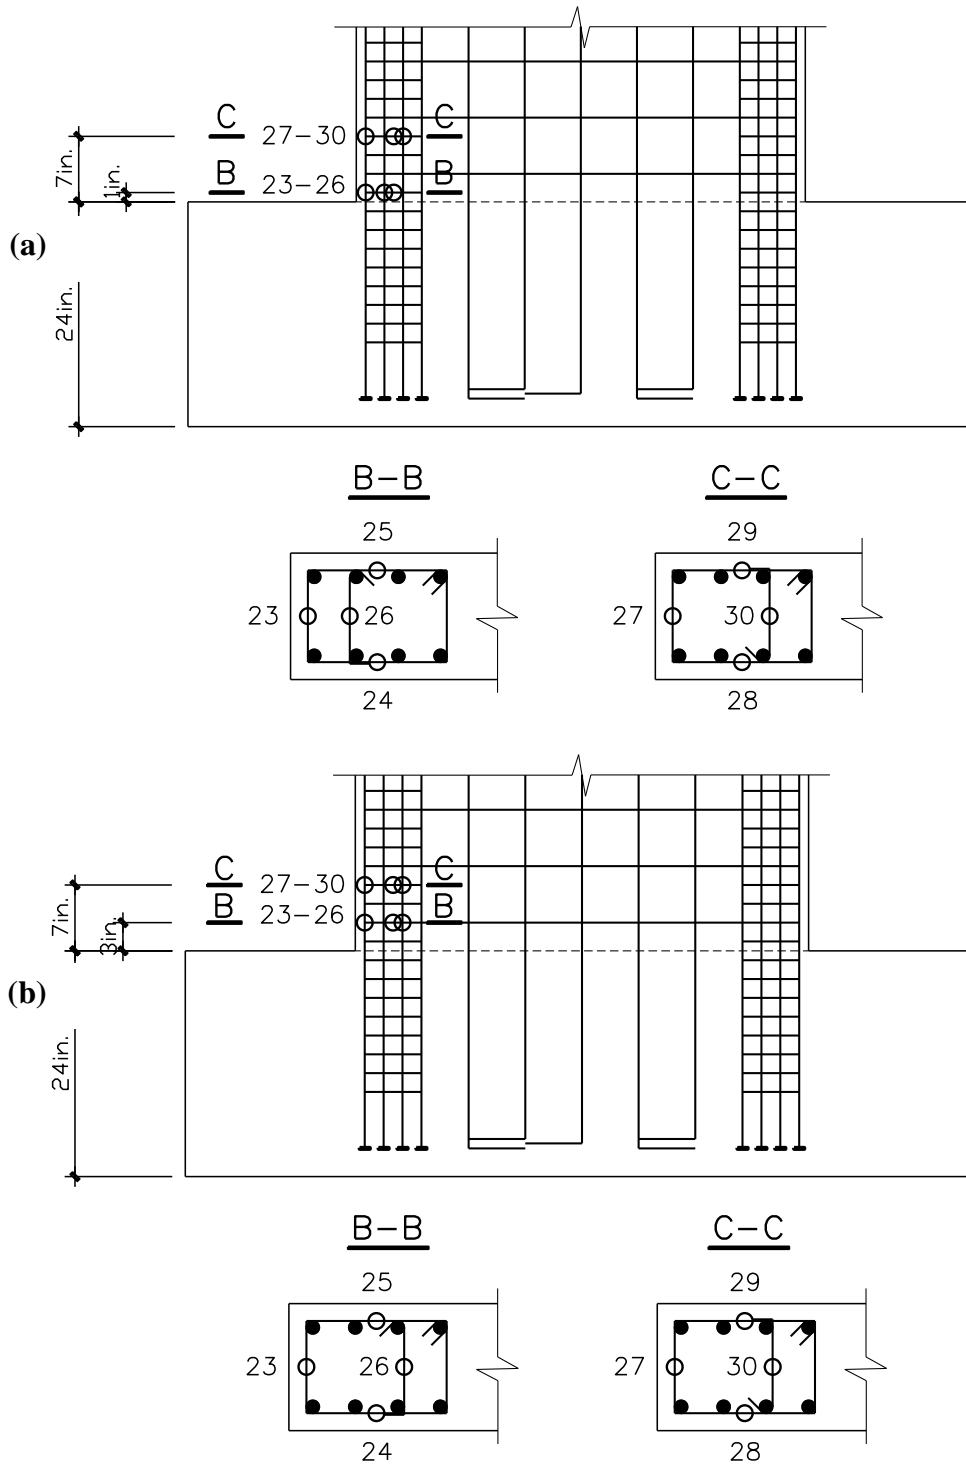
Strain gauge layout on boundary transverse reinforcement
